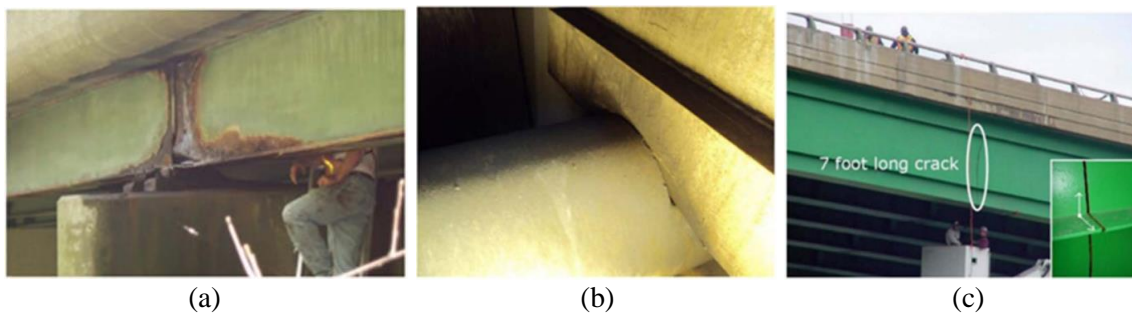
The Most Common Type of Damage in Bridge a) Corrosion, b) Buckling, c) crack.
